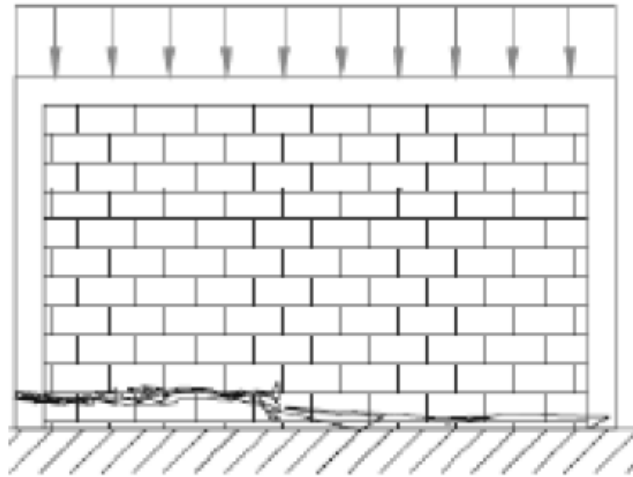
Cracking in confined masonry under monotonic gravity loads
